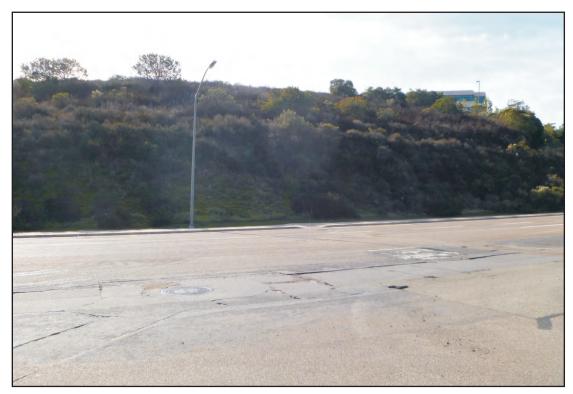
The view of PCCD South Education Center facing south on Olmeda Way at the intersection of Rancho Bernardo Road.
